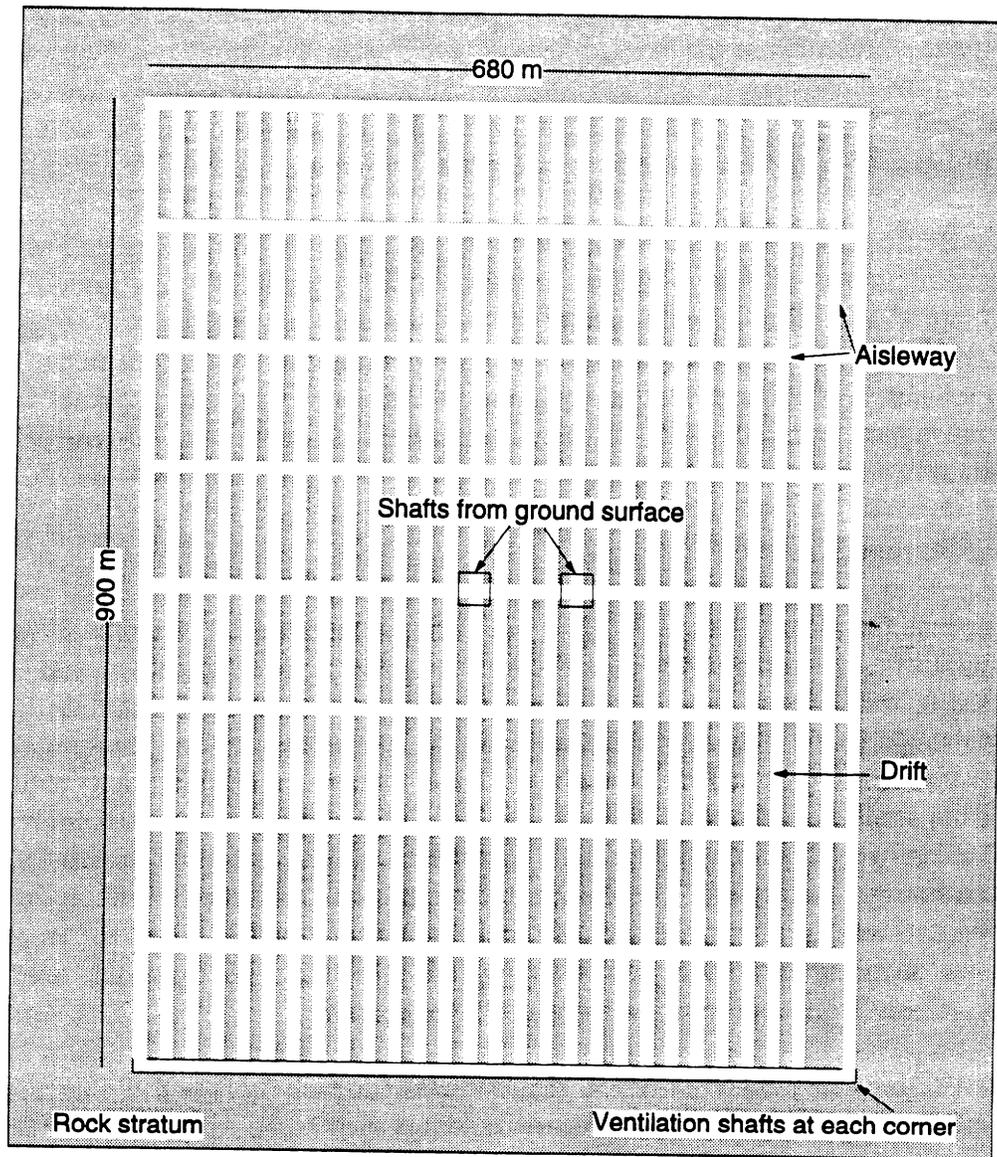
Underground Site Layout, U_3O_8 , Mined-Cavity Storage Facility
